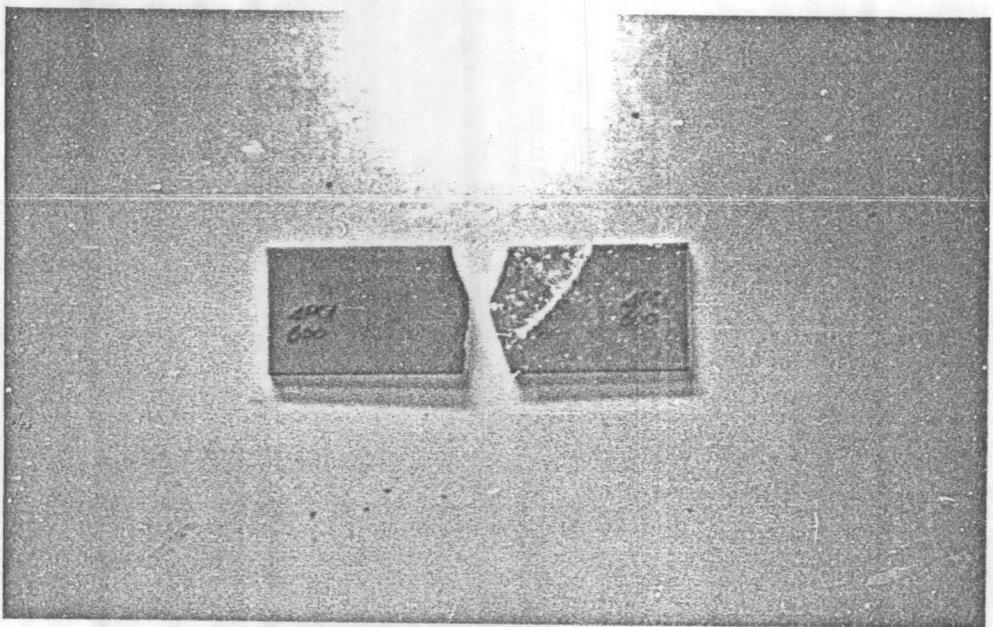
TEST SPECIMEN FOR PP AFTER FLEXURAL TEST
